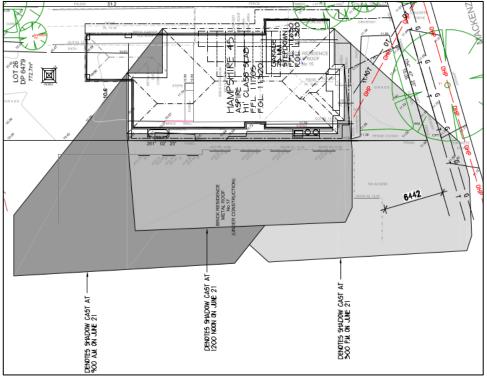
Submitted overshadowing diagram demonstrating overshadowing to southern adjoining dwelling at winter solstice (21 June).
